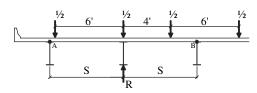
Loading diagram for interior girder with two lanes loaded and three wheels to beam.
